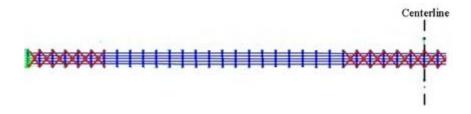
Lateral Bracing Pattern for 60 m Span Footbridge
